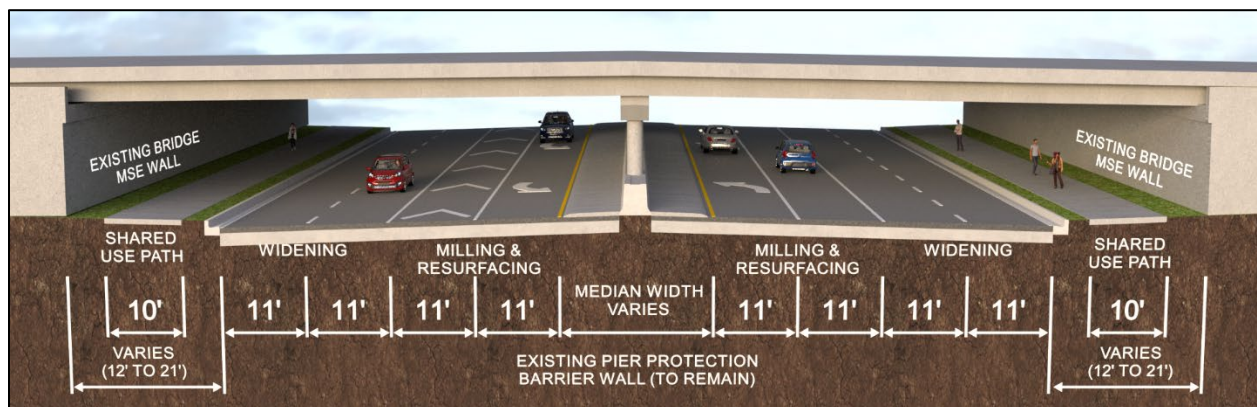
| Branch Forbes Road – Proposed Typical Section Under I-4
